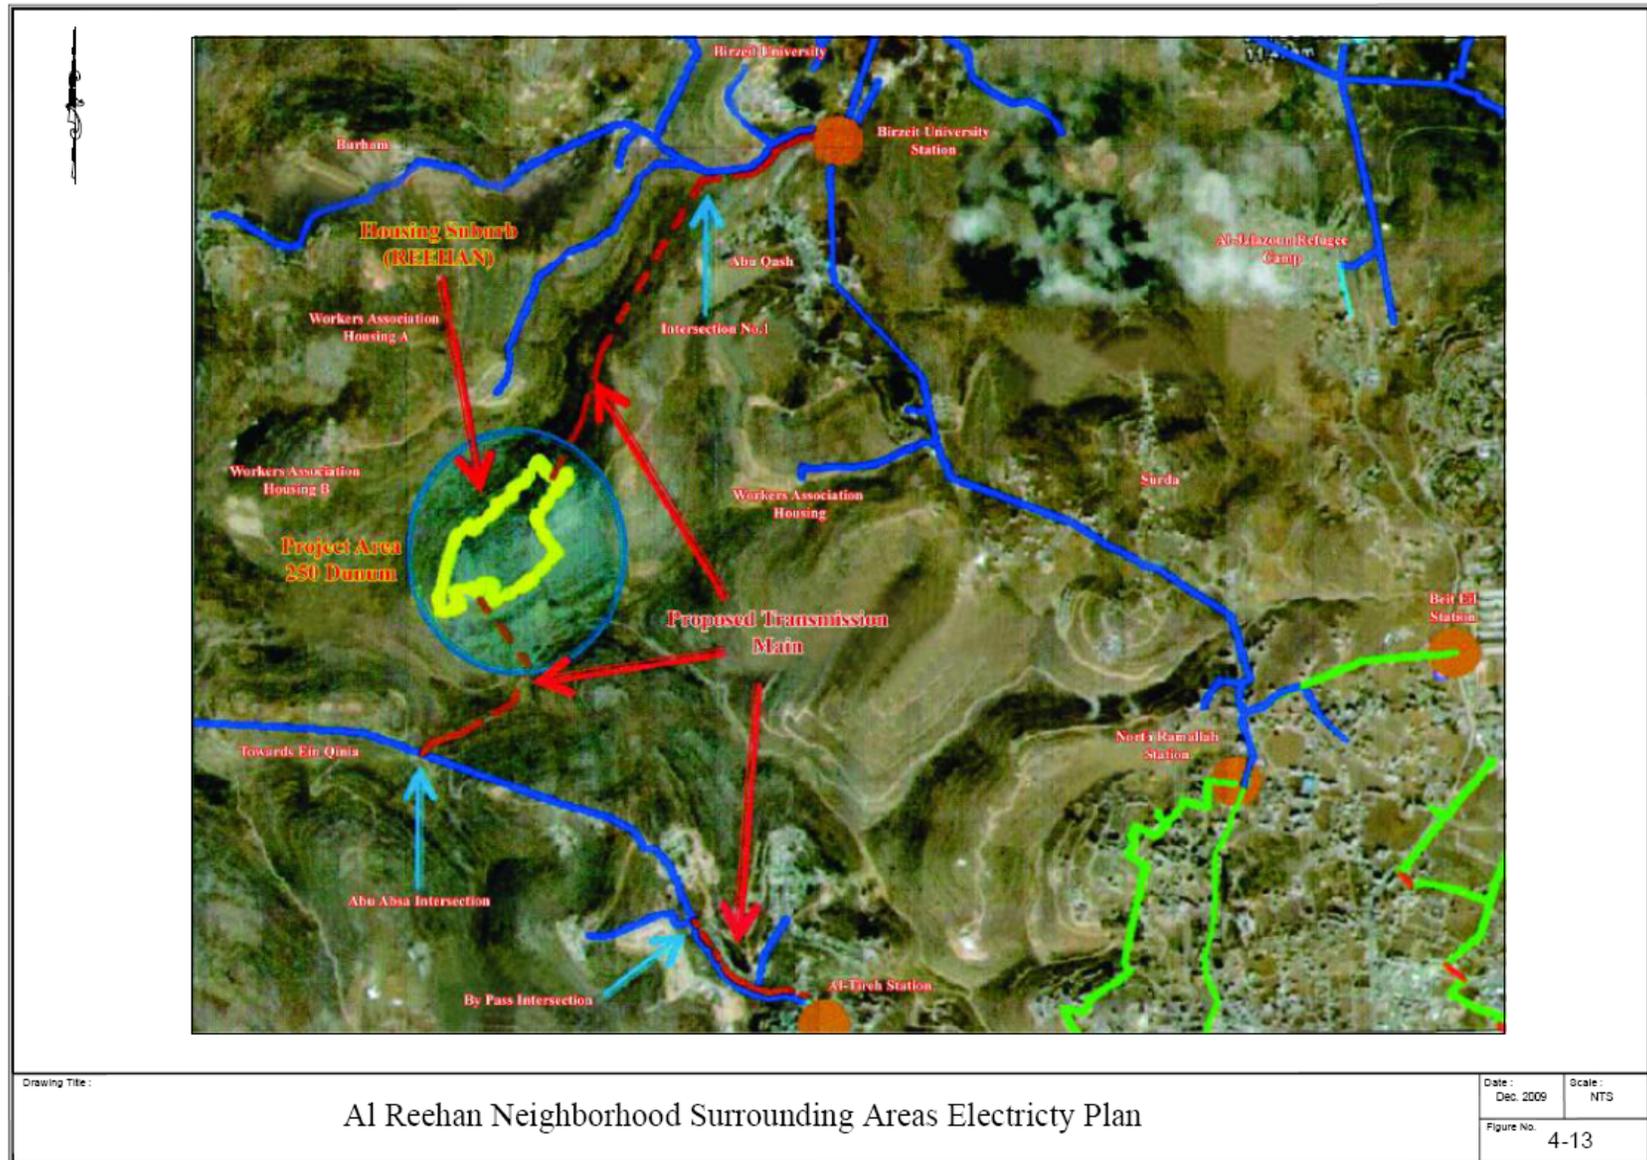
Site Plan for the Proposed Electrical Mainlines and Electrical Stations
